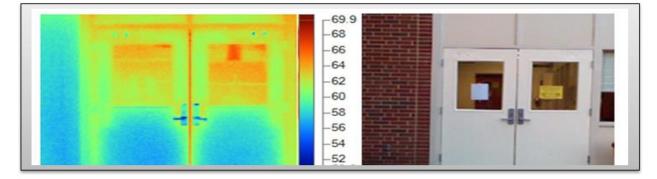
Sample of thermal and visible light image of a door in building 1.
